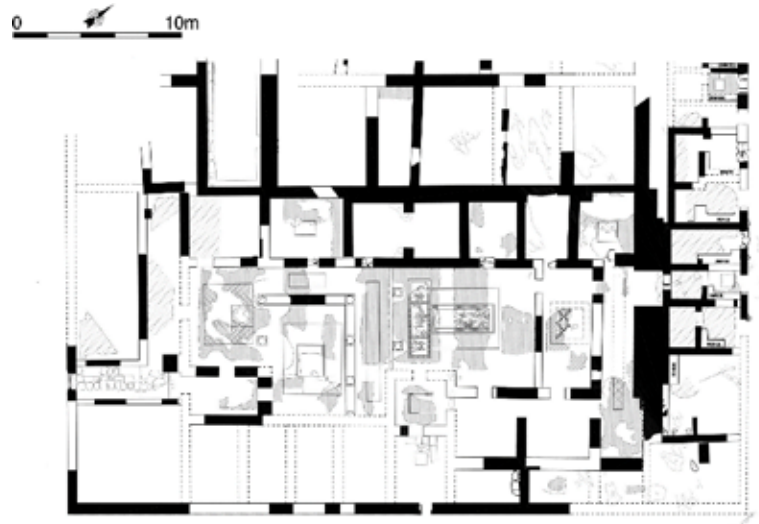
seleucia pieria, house house of the drinking contest, early third century CE, plan
